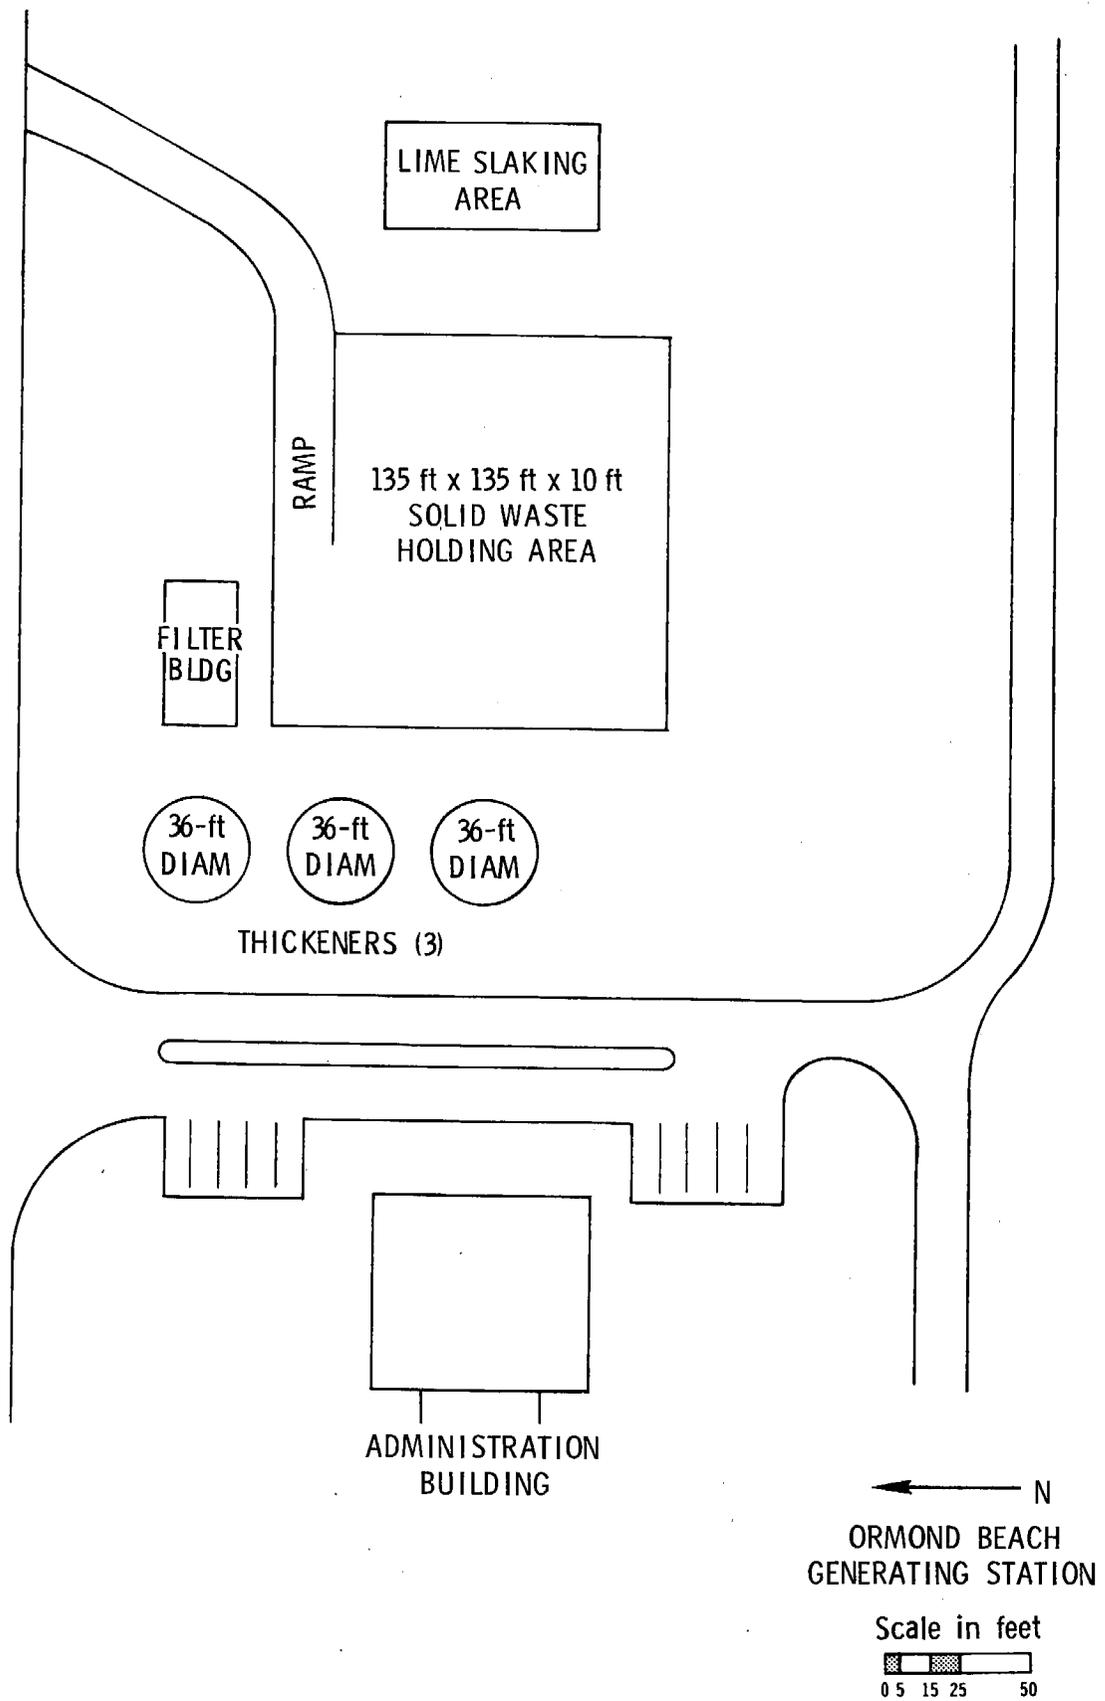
Other scrubber system equipment siting, alternative location: Ormond Beach
